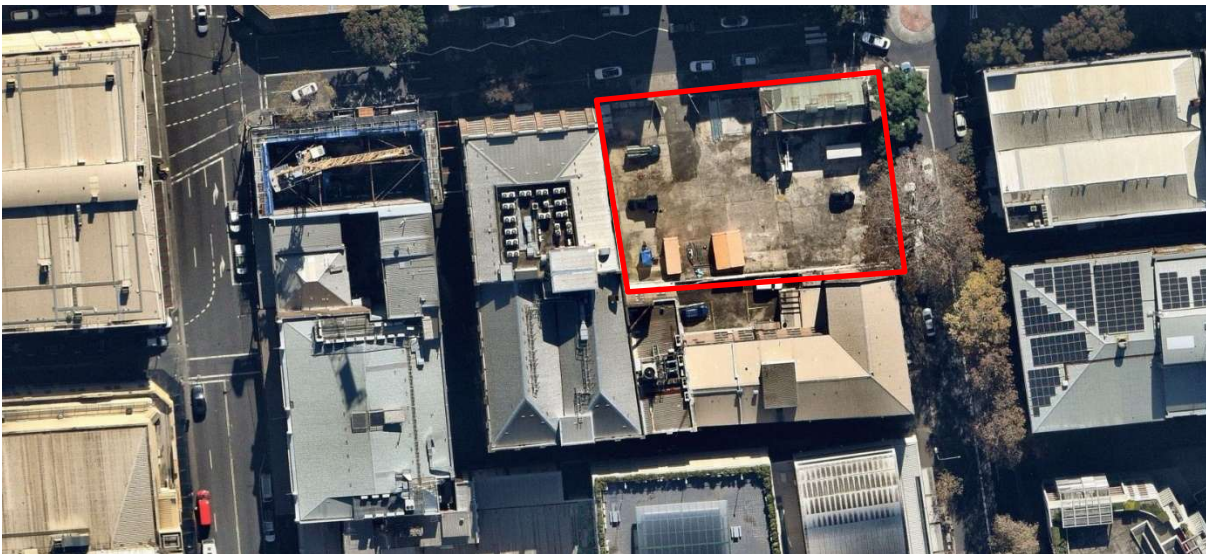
Current aerial photograph c.2025 detailing the removal of structures within the subject site.
